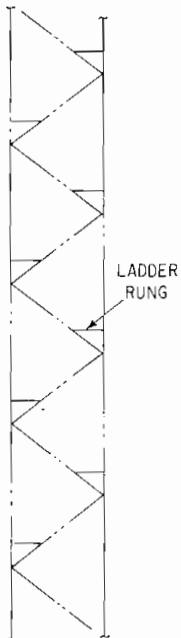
Ladder steps welded to tower structure.
